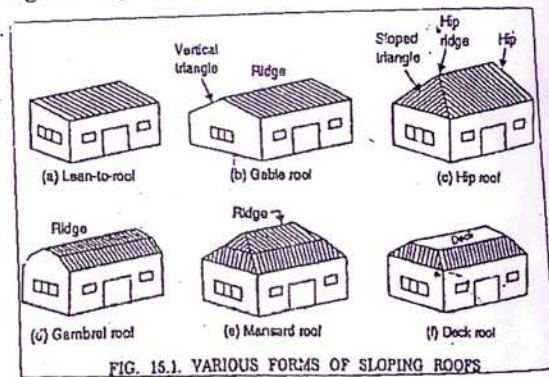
VARIOUS FORMS OF SLOPING ROOFS
